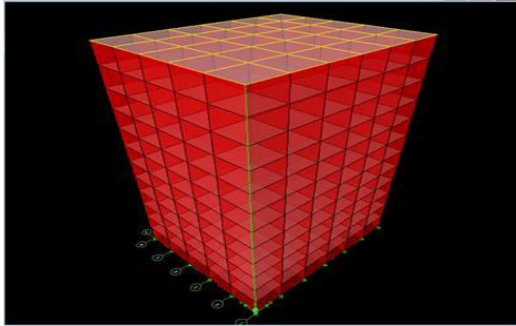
Elevation of twelve storeyed Building Model 1 (full infill)
